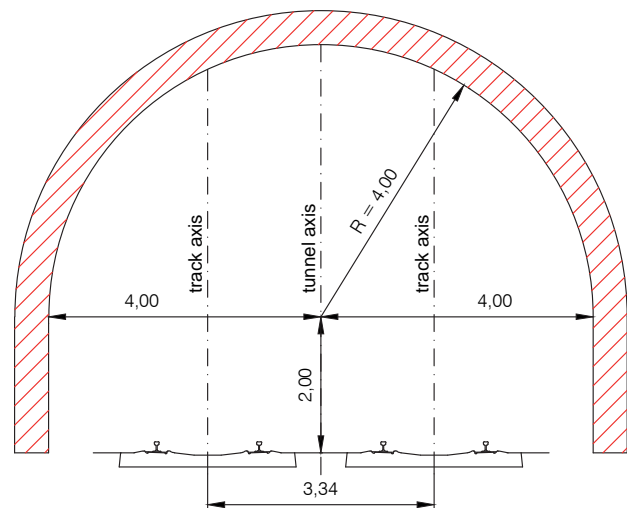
Cross-sectional profile of the St. Gotthard crest tunnel (dimensions in m)
